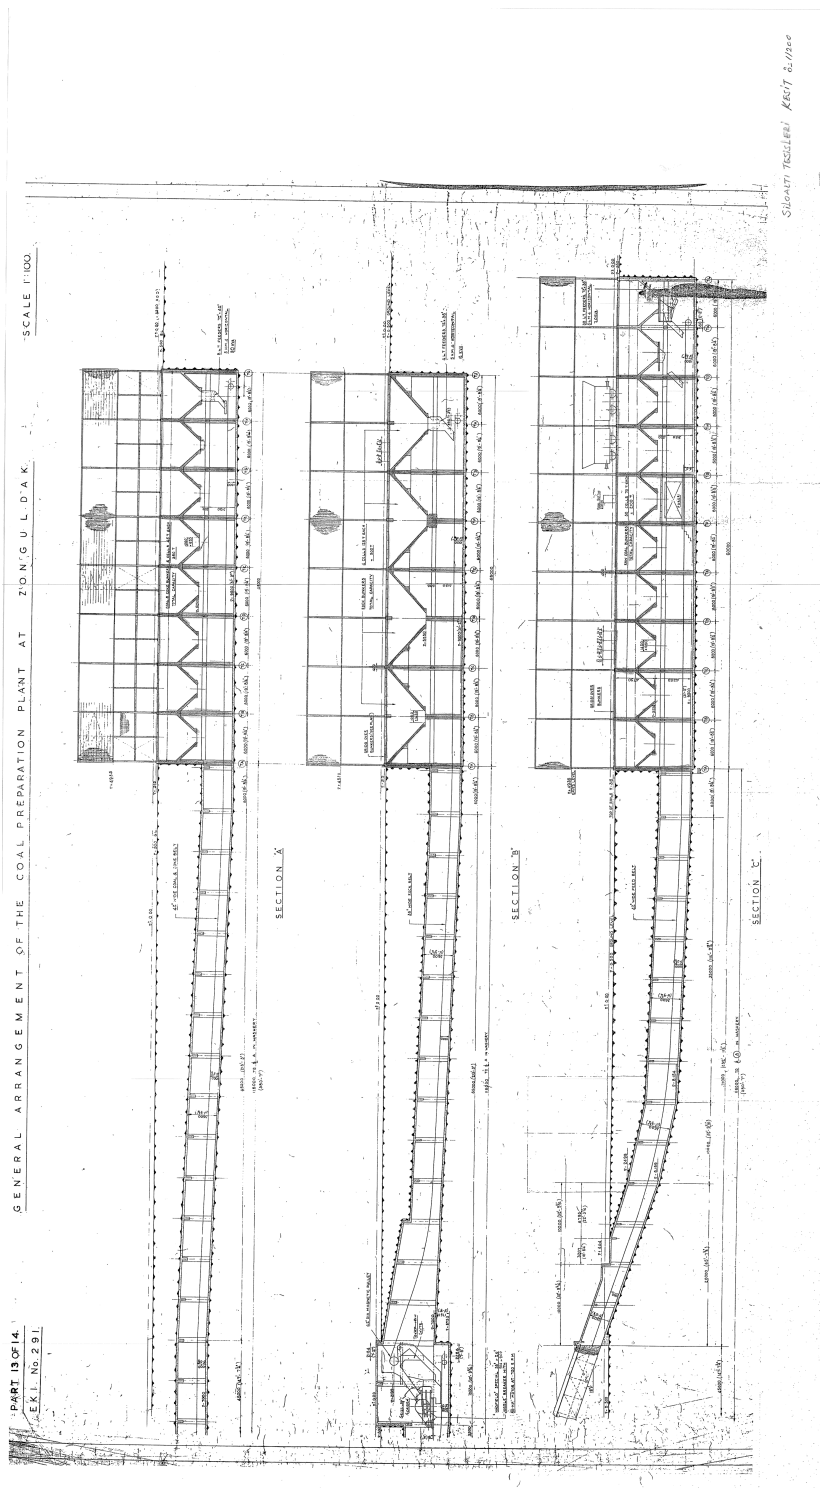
A, B, C sections of site 1/200 scale (TTK Archive, 2019).
